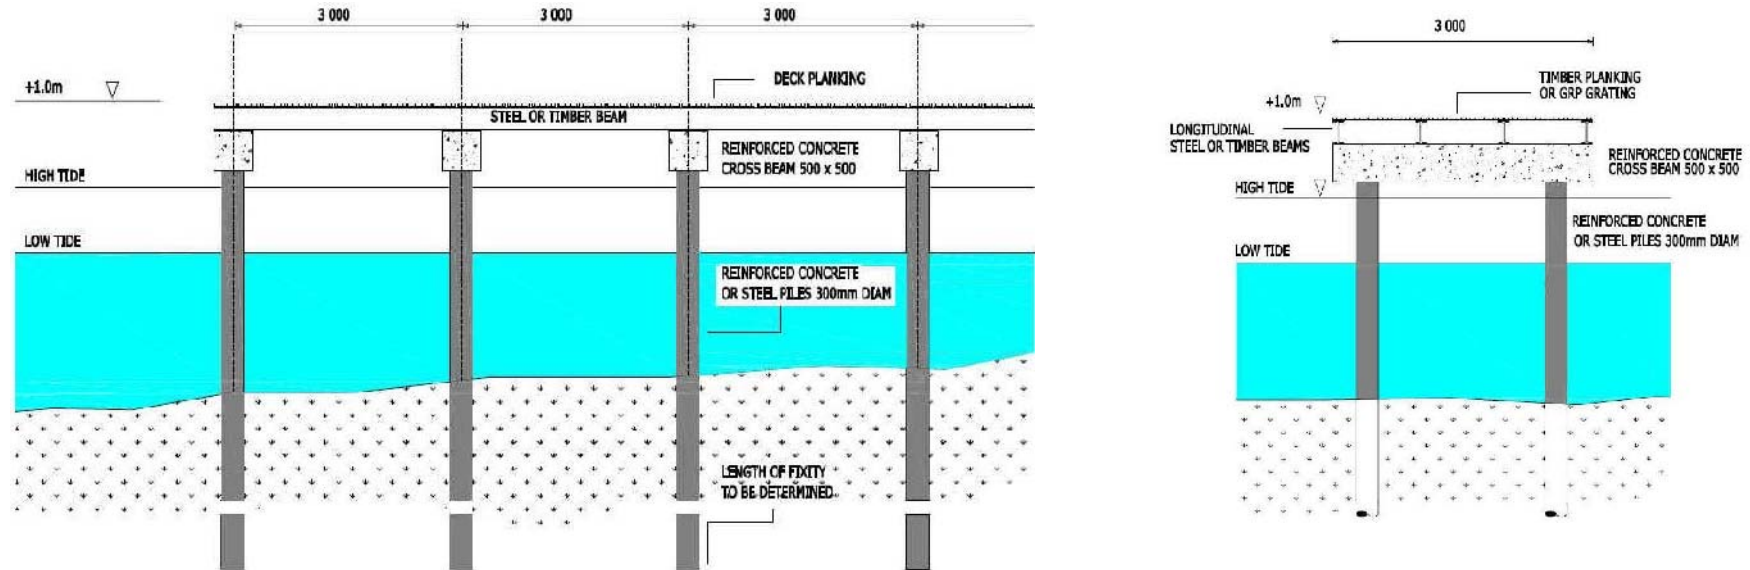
Piled jetty in elevation (left) and cross section (right)
